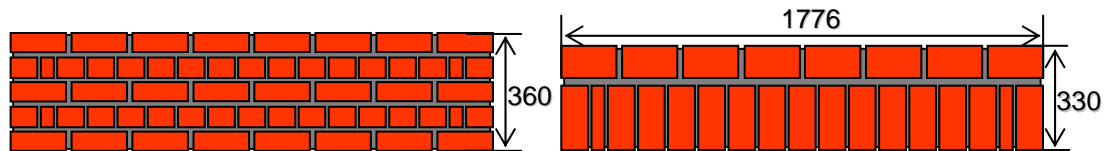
Elevation view (left) and bottom view (right) of a specimen
